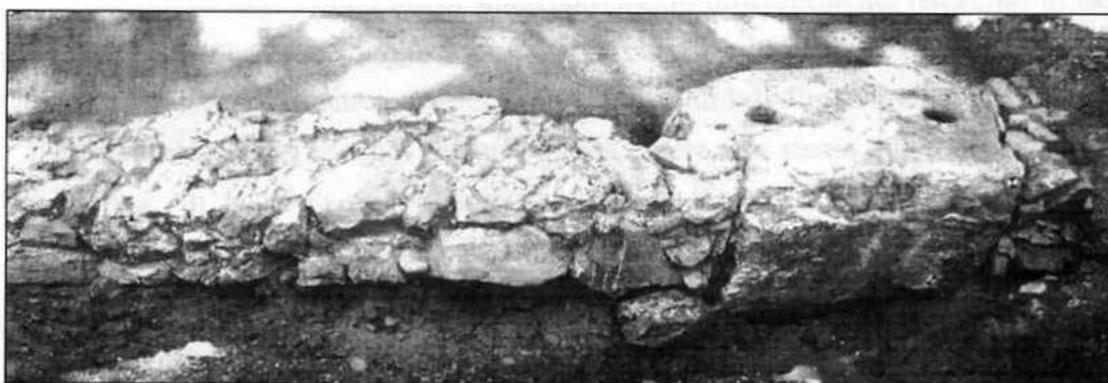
Side view of the foundation wall with the stone base-block for the studs.
